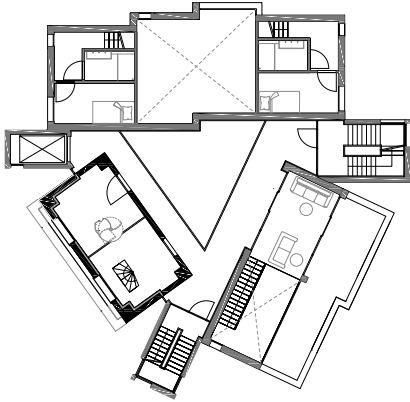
Seventh floor, scaled to fit - playroom, lounge, type B apartment
